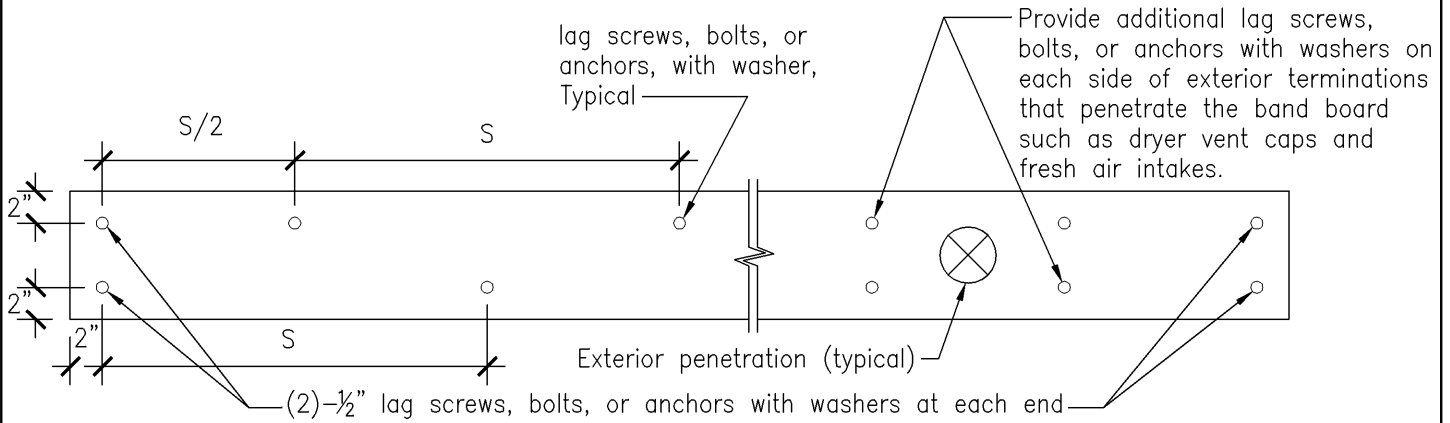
FASTENER SPACING AND CLEARANCES AT LEDGER BOARD
